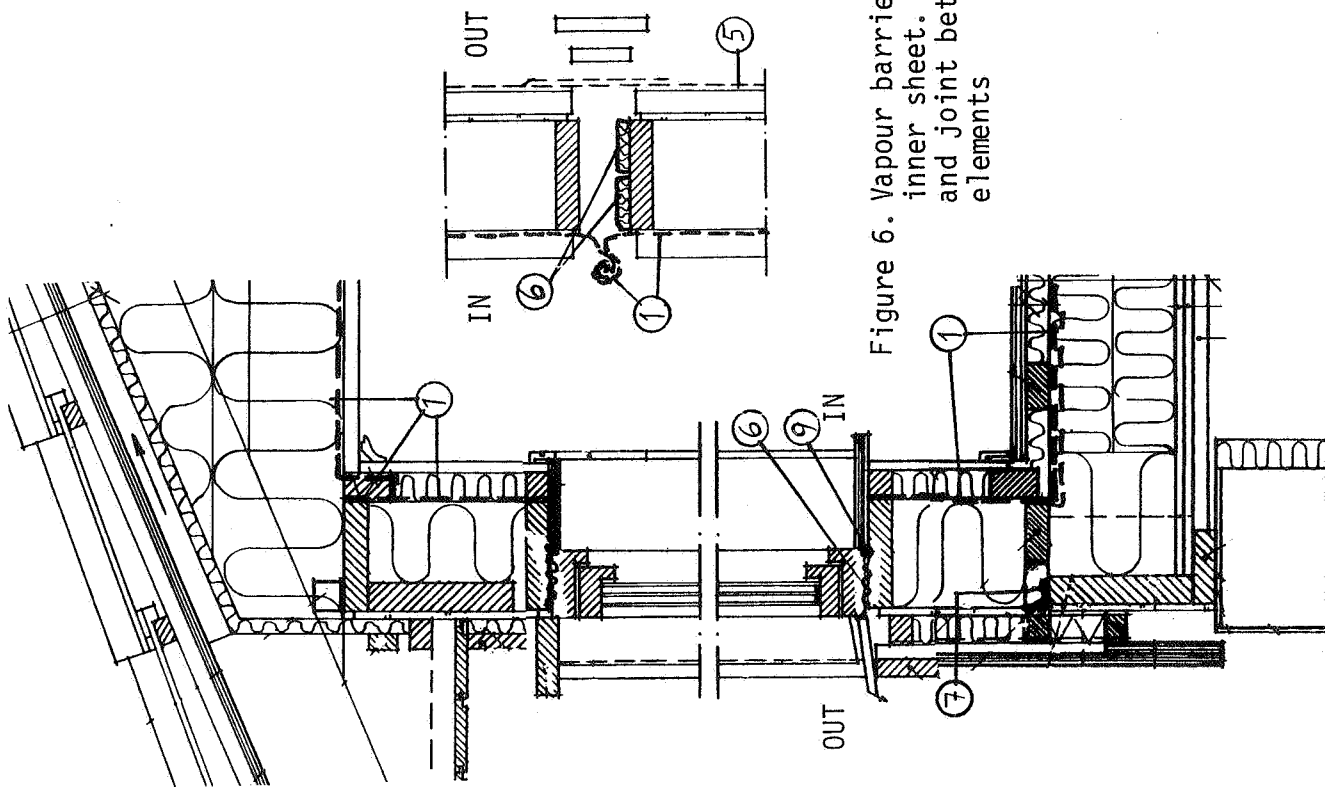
Vapour barrier 50 mm behind inner sheet. Wall section and joint between wall elements
